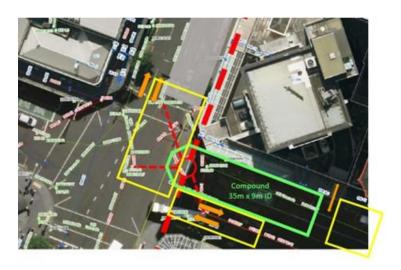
Area within which open cut trenching to connect local wastewater lines to the shaft will be required
